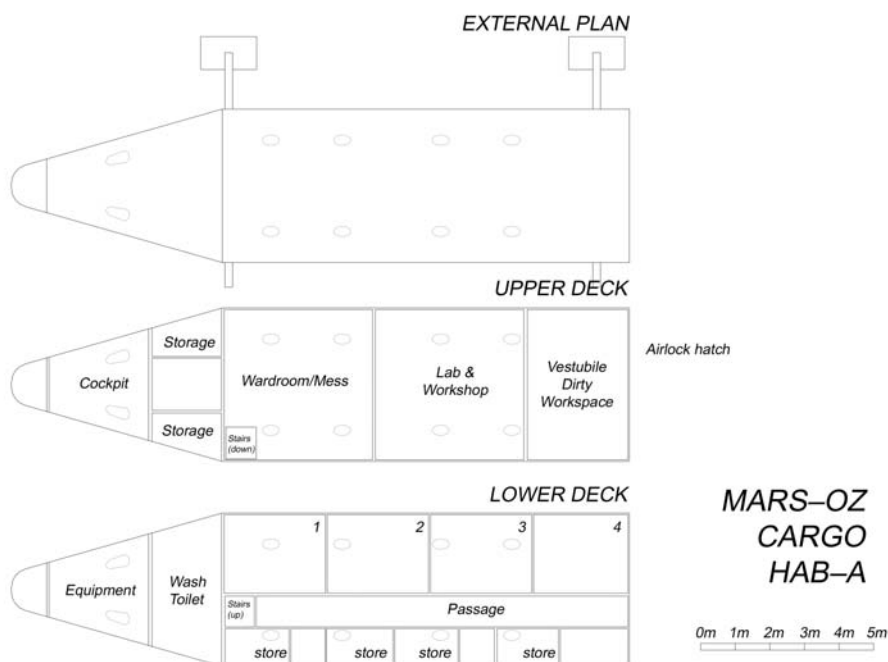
Plan views of MARS-OZ habitat. Drawing by Tristan Sterk.
